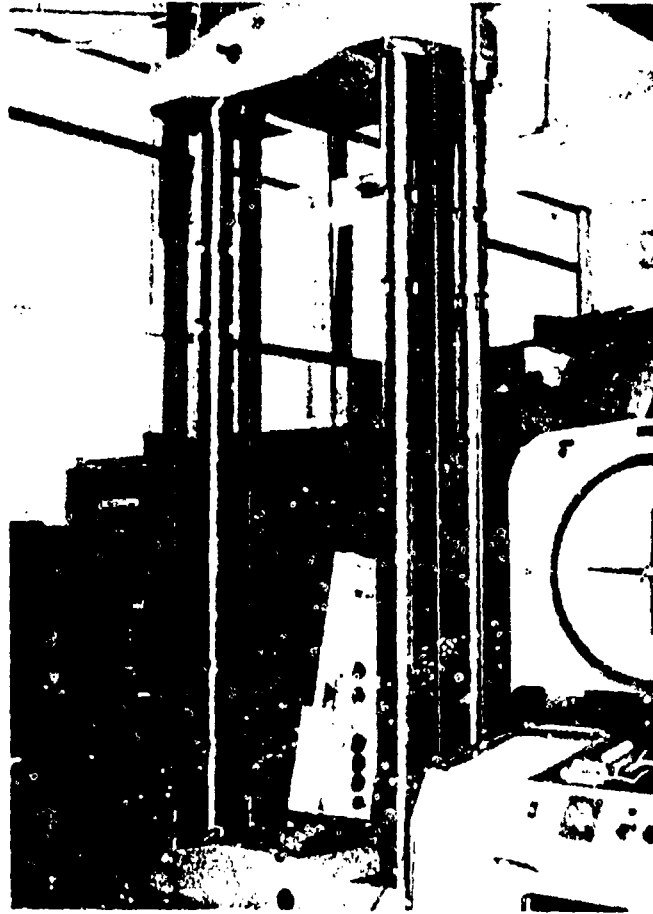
Test Arrangement -- King Post Truss and Connection Test.
